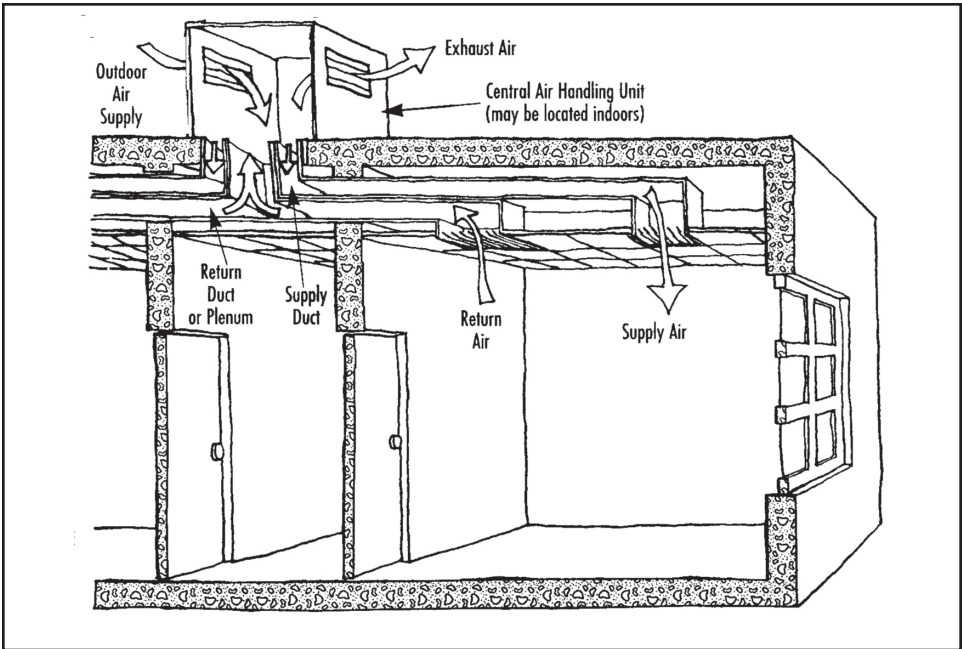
Central Air Handling Unit (source: EPA Tools for Schools)
